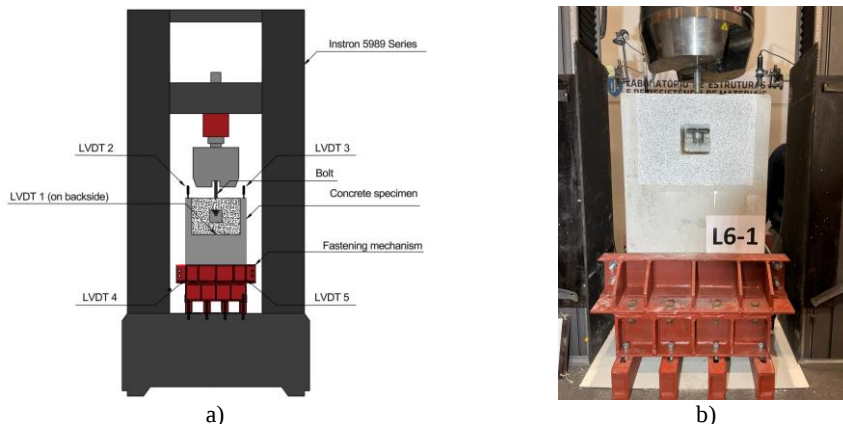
Testing campaign: a) Schematic layout of the test setup; b) General view of the experimental setup.
